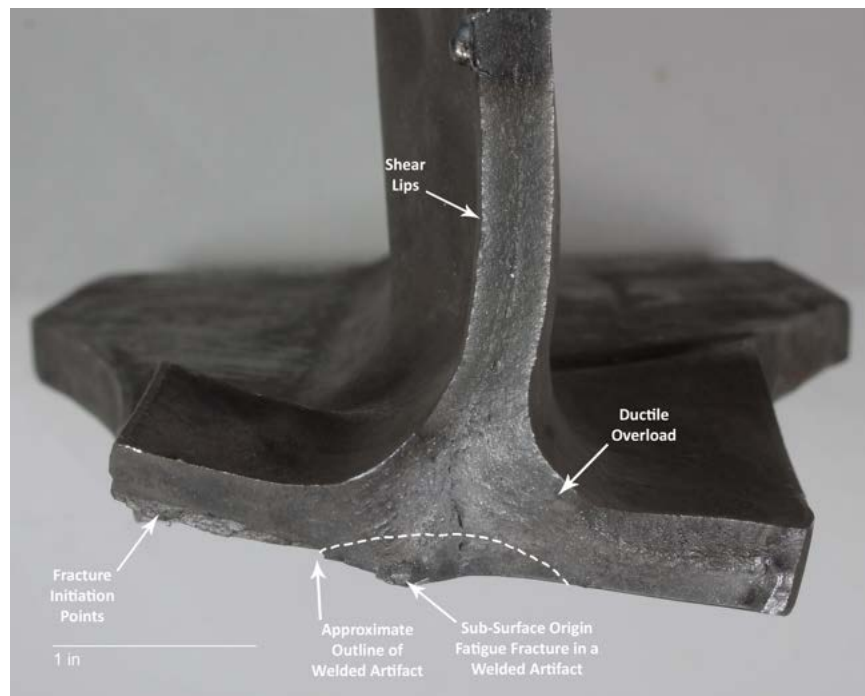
W24RBS-0.25NGTW-T59 bottom flange fracture looking towards the end-plate.
